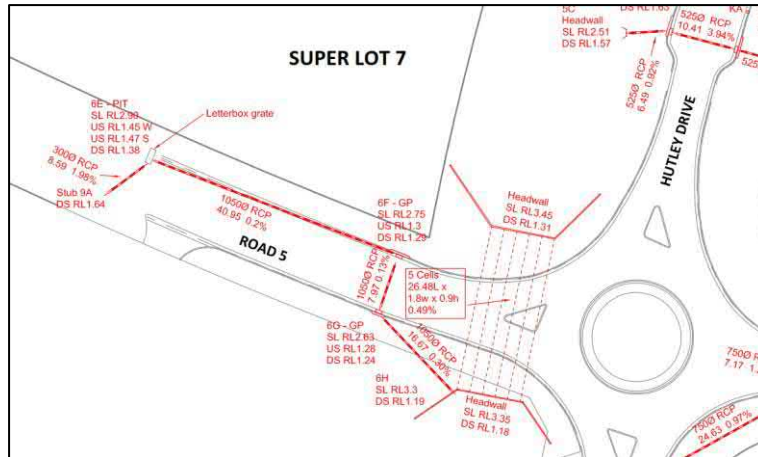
Excerpt from NDC 1B Drainage Summary 3 - WAX Plan
